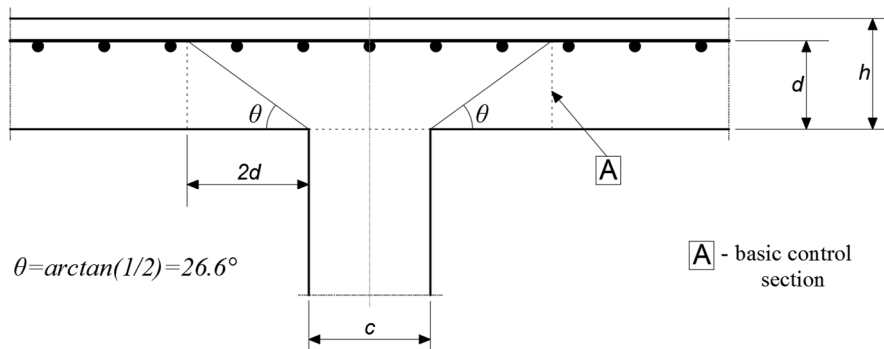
Cross-sectional view of calculation model adapted from ('SS-EN 1992-1-1', 2008).
